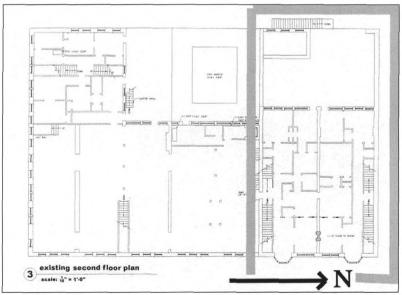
Existing second floor plan (the Ziepprecht Building is highlighted)
